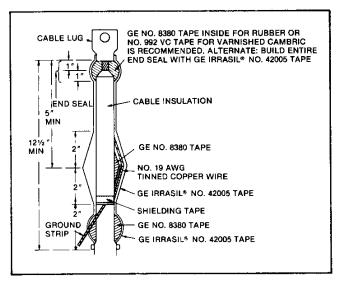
Termination of shielded, 5000-volt cable showing stress-cone construction.
